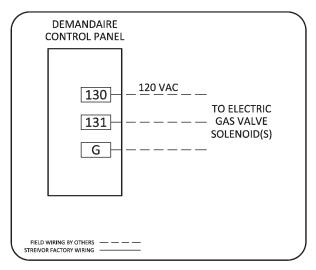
Electric Gas Valve Circuit Output Power Wiring
